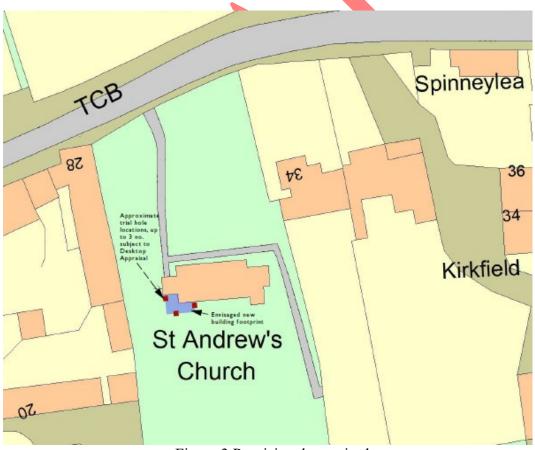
Provisional test pit plan Plan provided by client. North to top of picture
